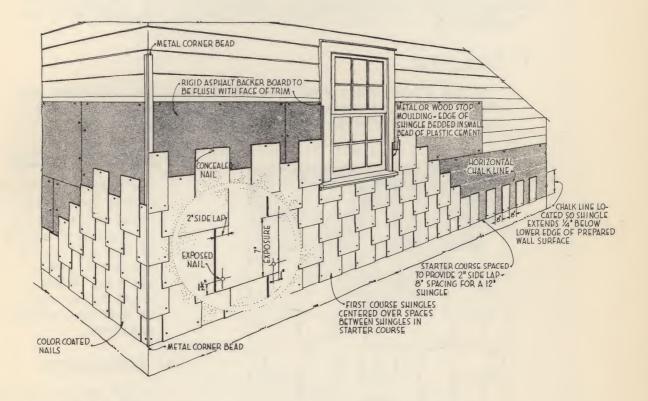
Application of Giant Individual Shingles to Side Walls by the Wide Space Method.
